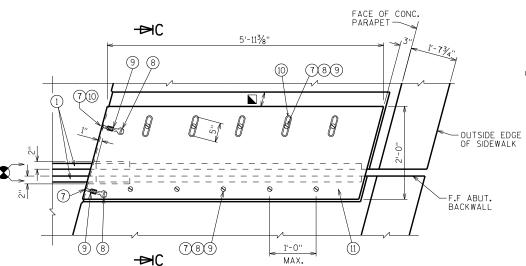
(PLATE AT WEST ABUTMENT SHOWN, PLATE AT EAST ABUTMENT SIMILAR)
